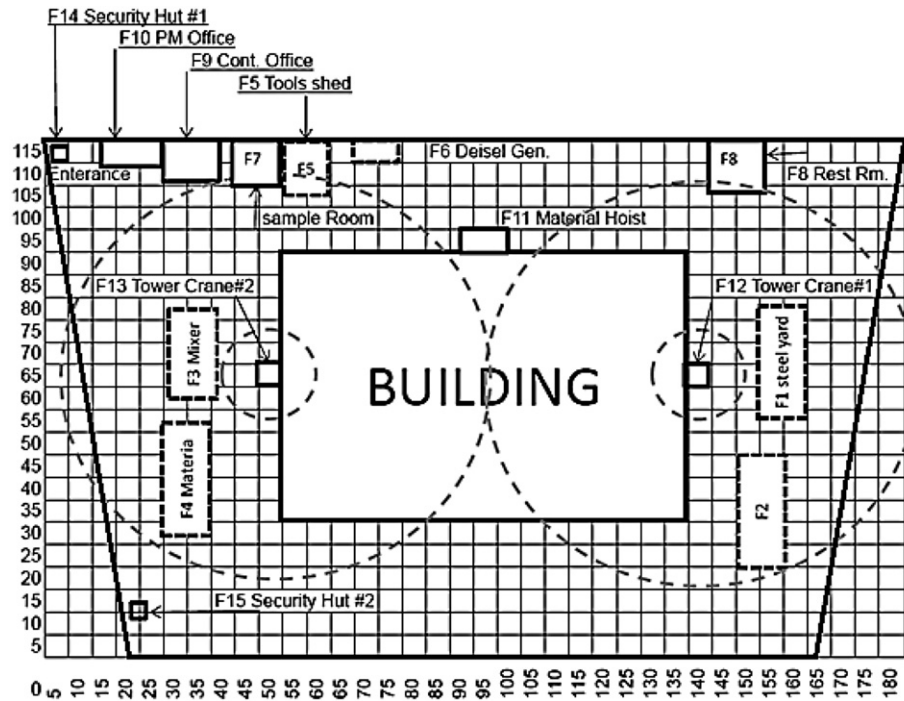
Original construction site layout prepared by the contractor for design example 2.
